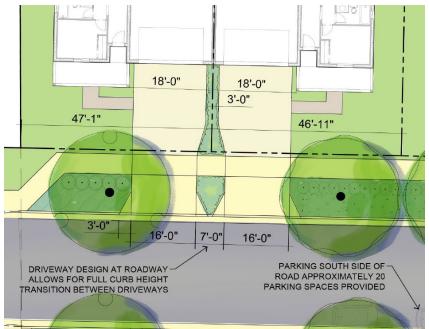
Driveway exceeds 12'. Applicant proposing variable width driveway between 16-18'.
